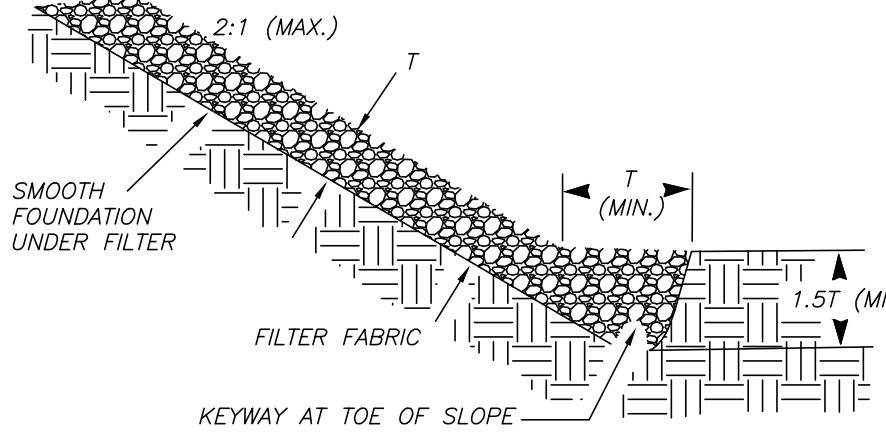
B: CONSTRUCTION OF A RIPRAP BANK WITH TOE PROTECTION (SOURCE: INDIANA EROSION CONTROL HANDBOOK)
